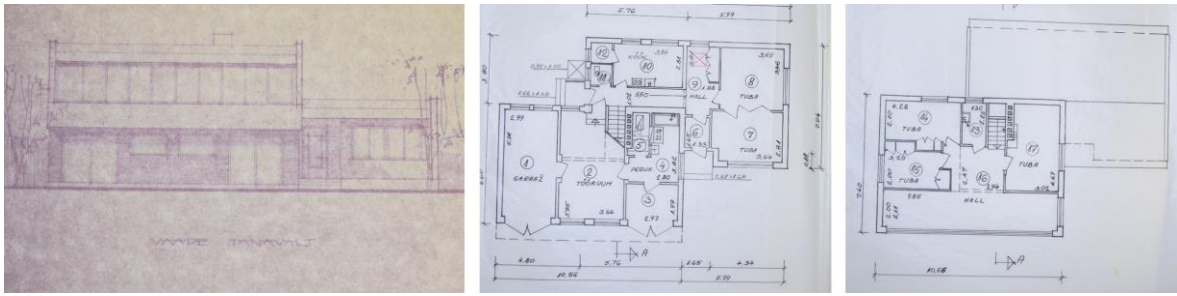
Lepa 3 (1973) in Pärnu-Jaagupi (left to right: elevation, ground floor layout, upper floor layout)
